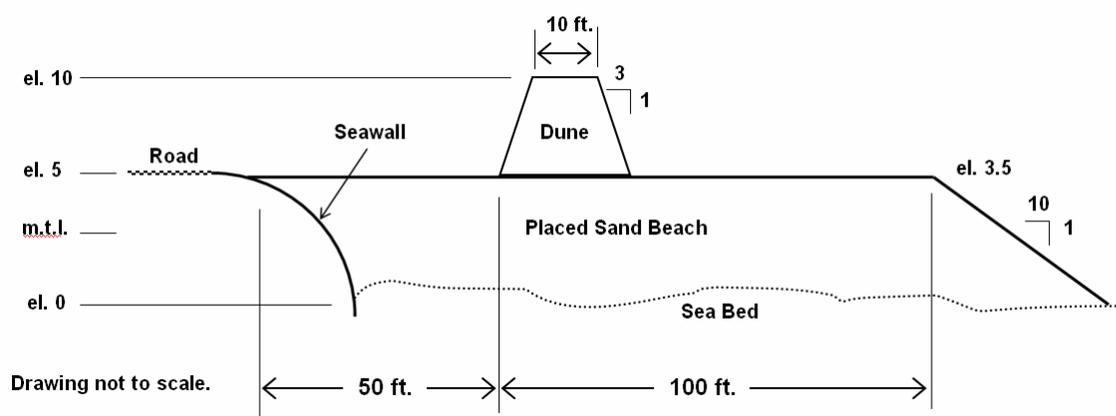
Elevation view, Alternative 3 and Alternative 4 (with dune) beach.
